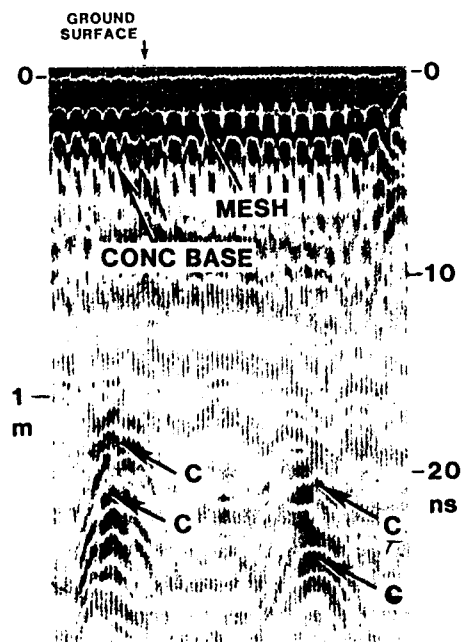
GPR profile over an airport taxiway showing steel reinforcing mesh in concrete and electrical conduits at depth. Width of scan is 1.5 m. 500 MHz antenna, 50 ns range. C = electric conduits.
